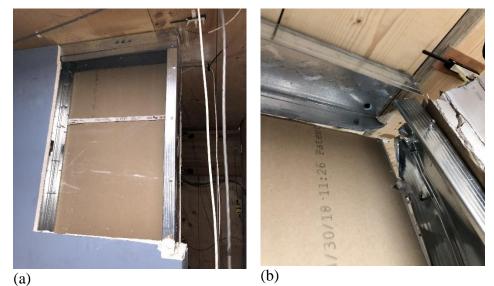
Post-test inspection after removal of gypsum board: (a) damage in the wall with telescoping detailing; (b) damage in the wall with a slip track connection
